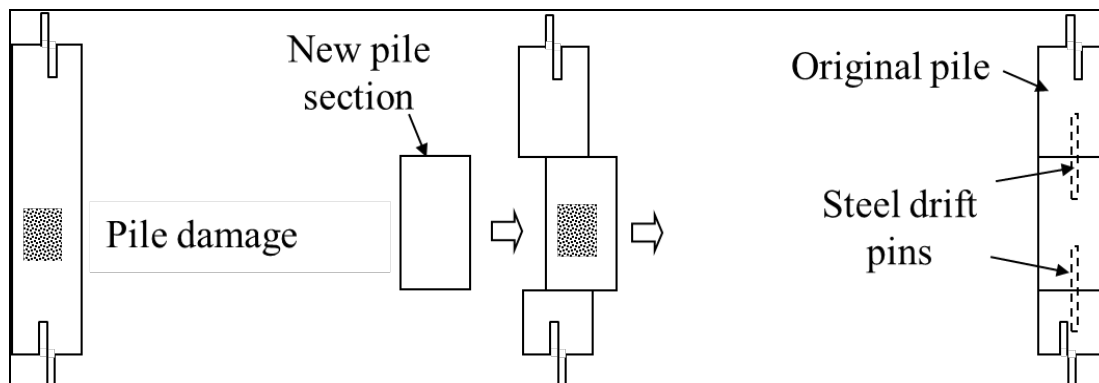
Replacement of a wood piece from a damaged timber pile.
